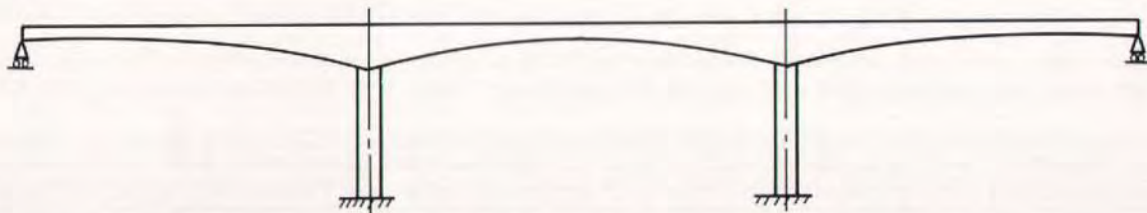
Typical reinforced or prestressed concrete plane frame.
